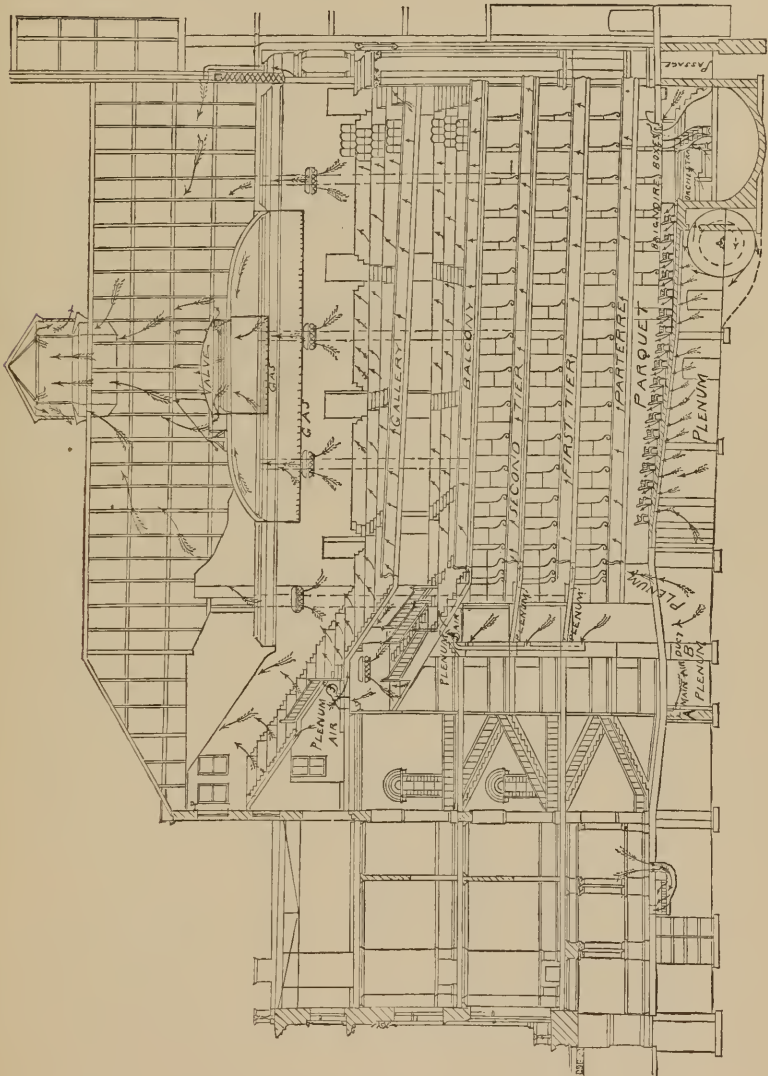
METROPOLITAN OPERA HOUSE, NEW YORK CITY.
